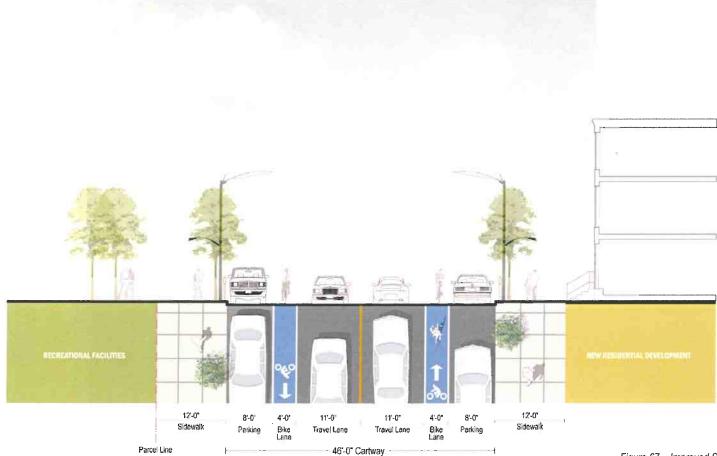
Improved State Street between Harrison Avenue and River Avenue
